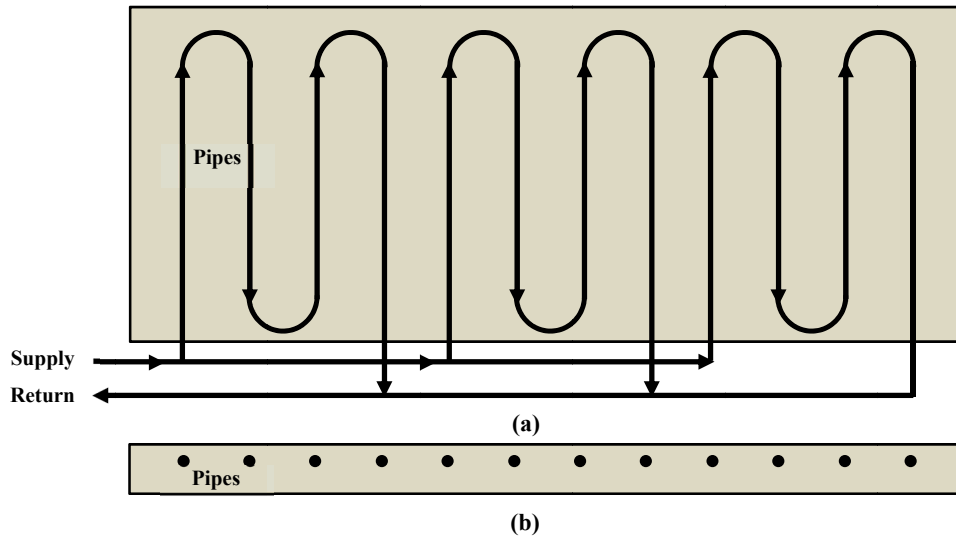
Typical pavement section of a hydronic snow-melting system, (a) plan view, (b) cross section view.
